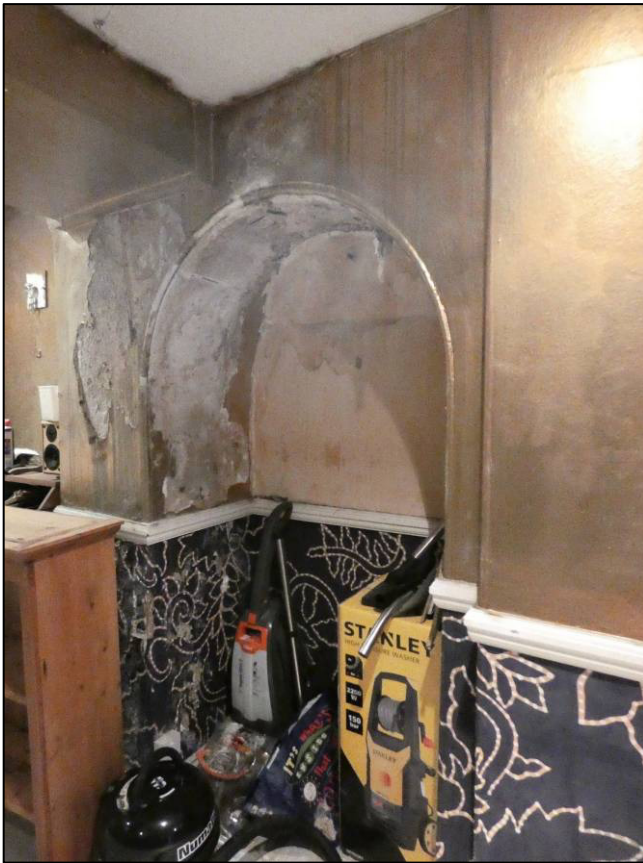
Room GF2S, north arched recess in east wall, looking N (photo 1/822).
